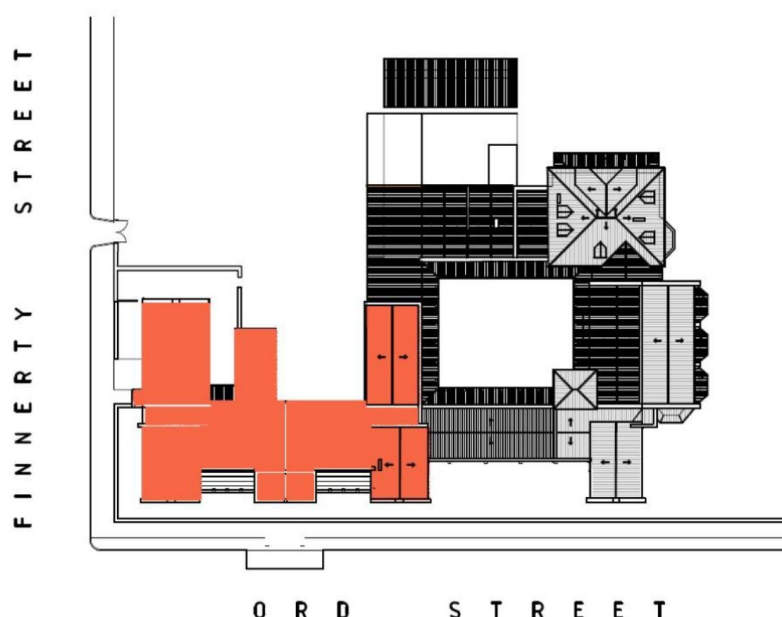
Phase 3 re-roofing plan (area included indicated in red)
